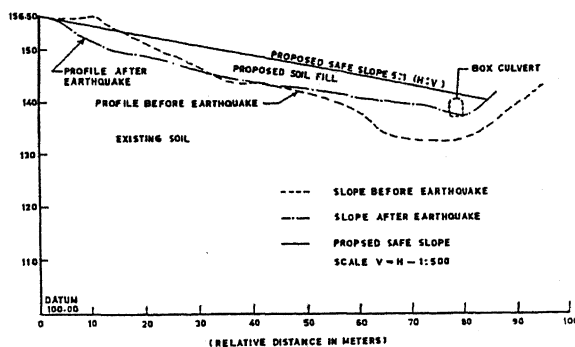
PROPOSED SAFE SLOPE FOR SECTION 1-1
